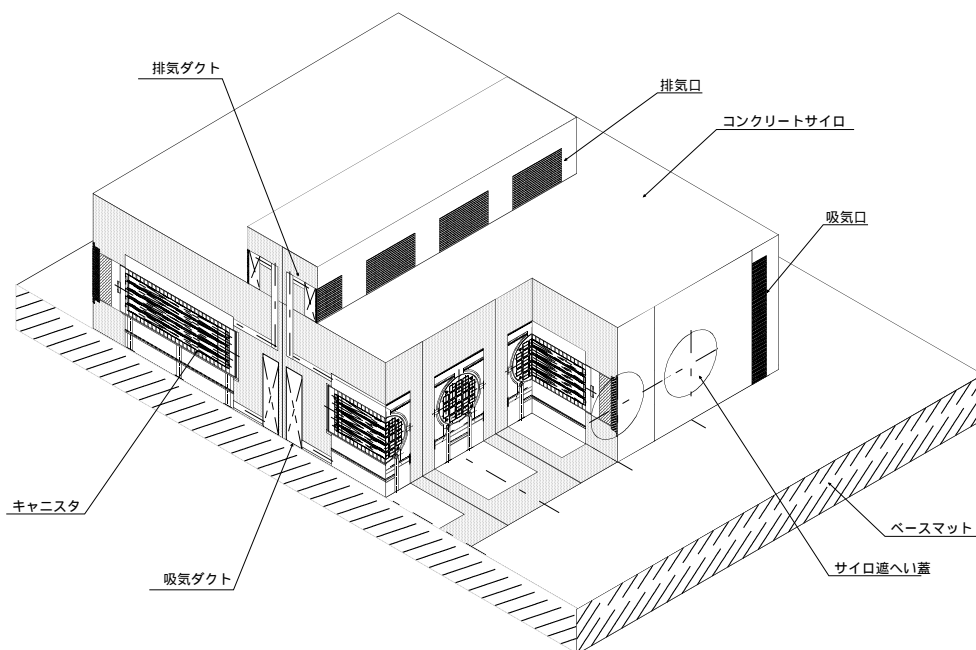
Concept of the Horizontal Storage System for Japanese Storage Facilities
